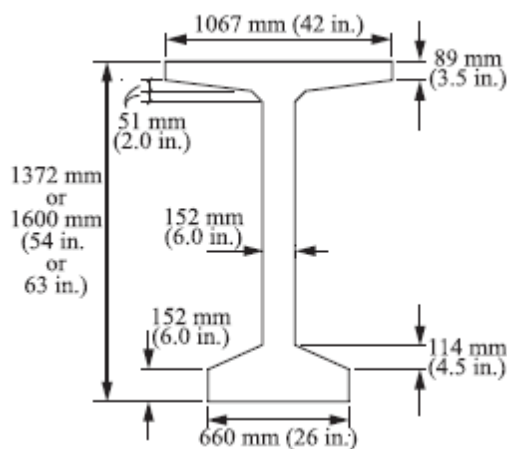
Typical dimensions of BT-63 and BT-54 girders
